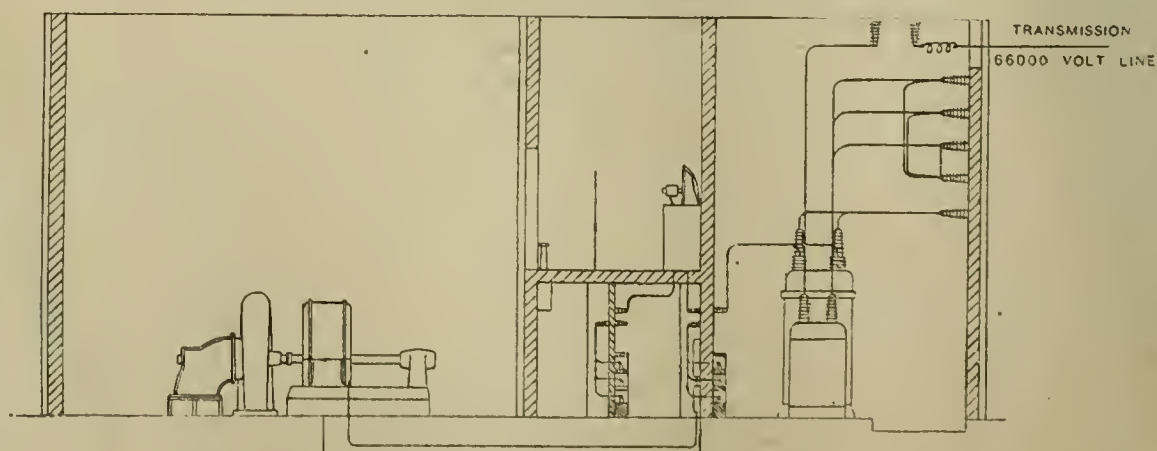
PROPOSED SWITCH ARRANGEMENT AT POWER HOUSE.
